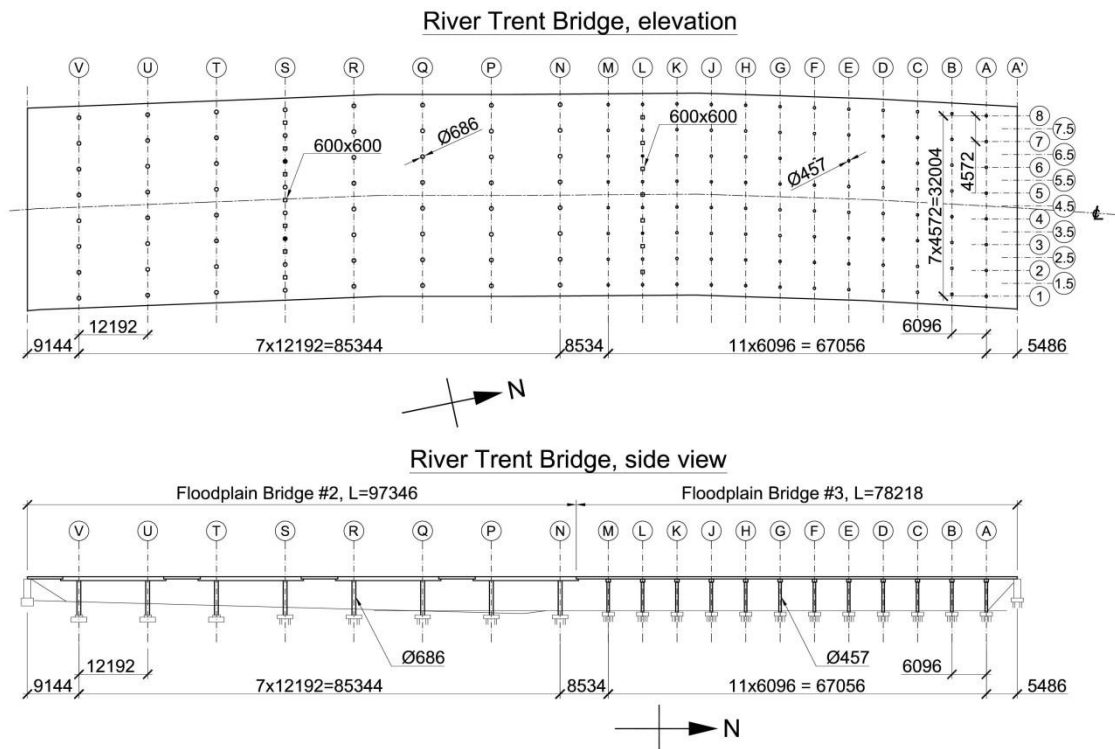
Sketch of the River Trent Bridge: elevation (top) and side view (bottom).
